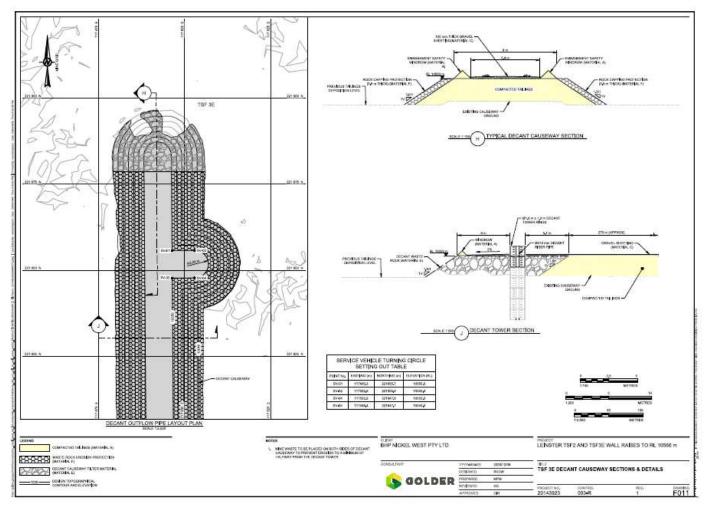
TSF3 Cell E Decant tower and causeway raise design
